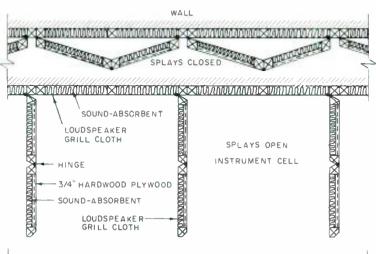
Details of construction of the folding wall panels shown in Fig. 1.
